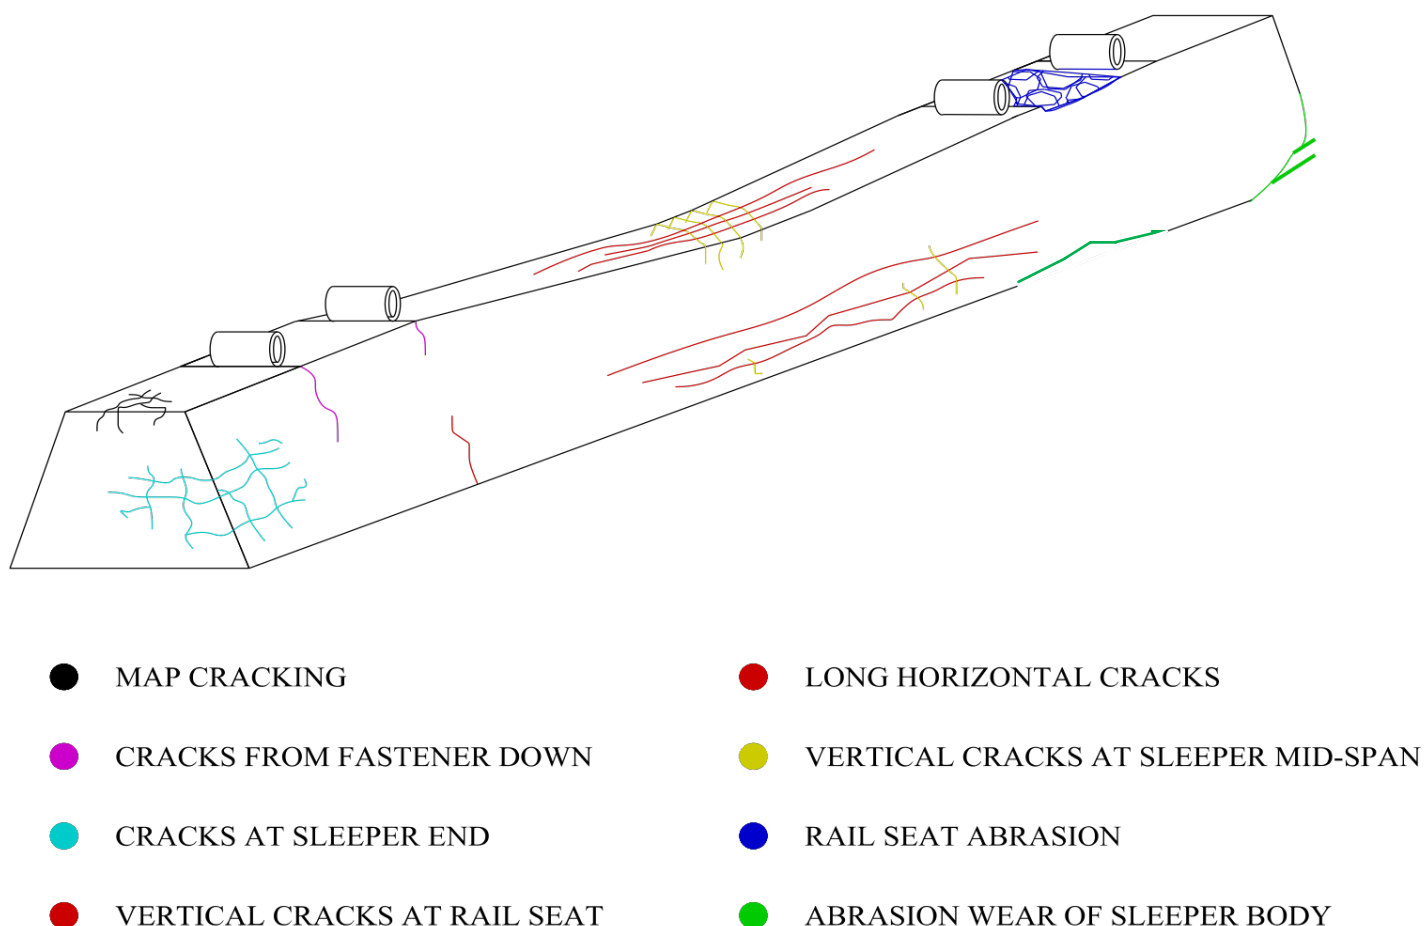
Typical Sleeper Damage Adapted from sources (Thun et al., 2008)
